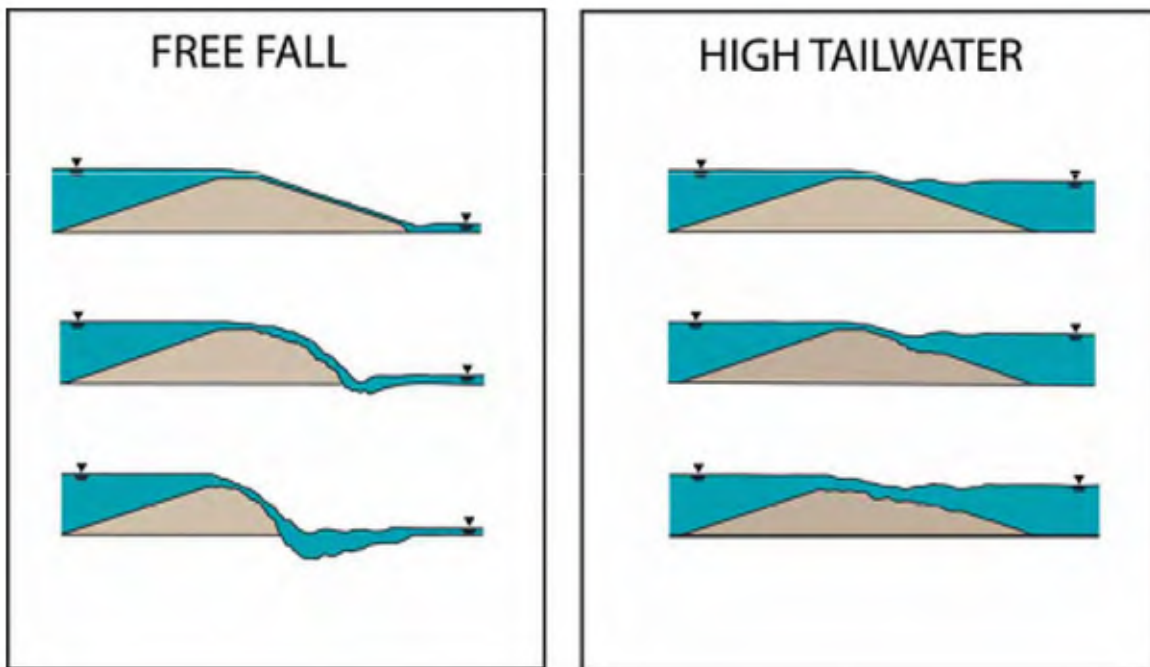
Embankment failure mechanisms (after Clopper and Chen 1988)
